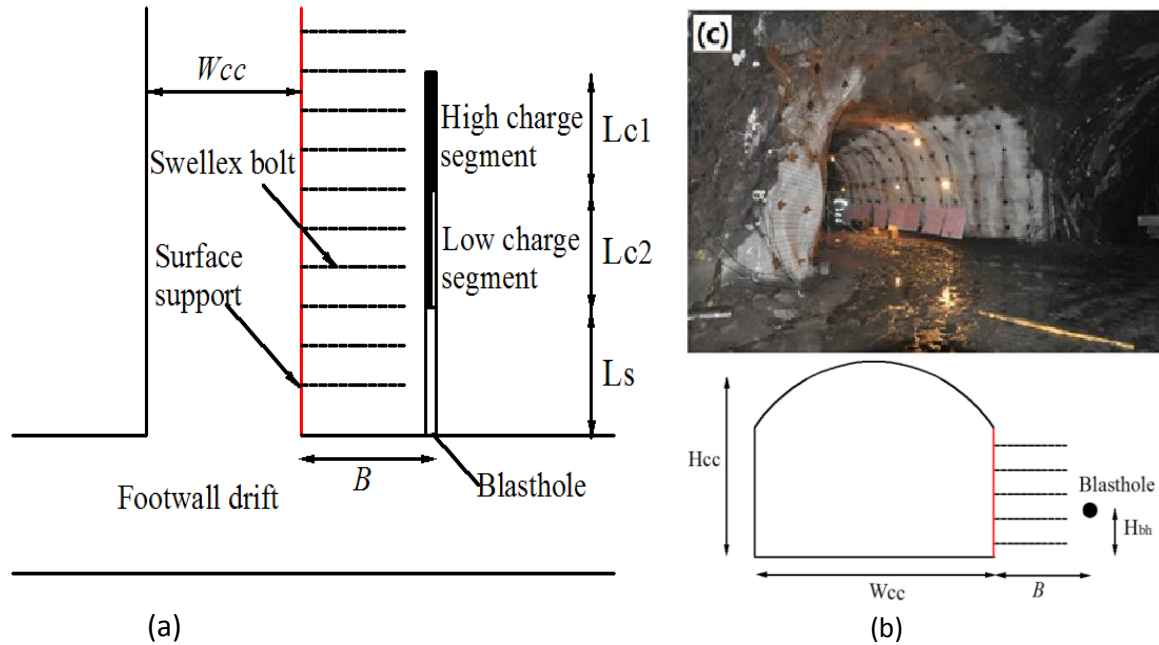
Schematic diagram of test layout and blast design. (a) Top view, (b) front view and (c) photo of instrumented side wall in Test 2
